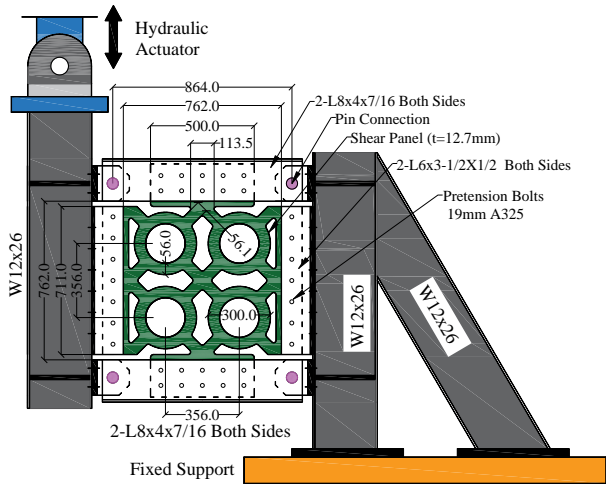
Ring-shaped steel plate shear wall model, specimen 2-13-1 (Egorova *et al.* 2014)
